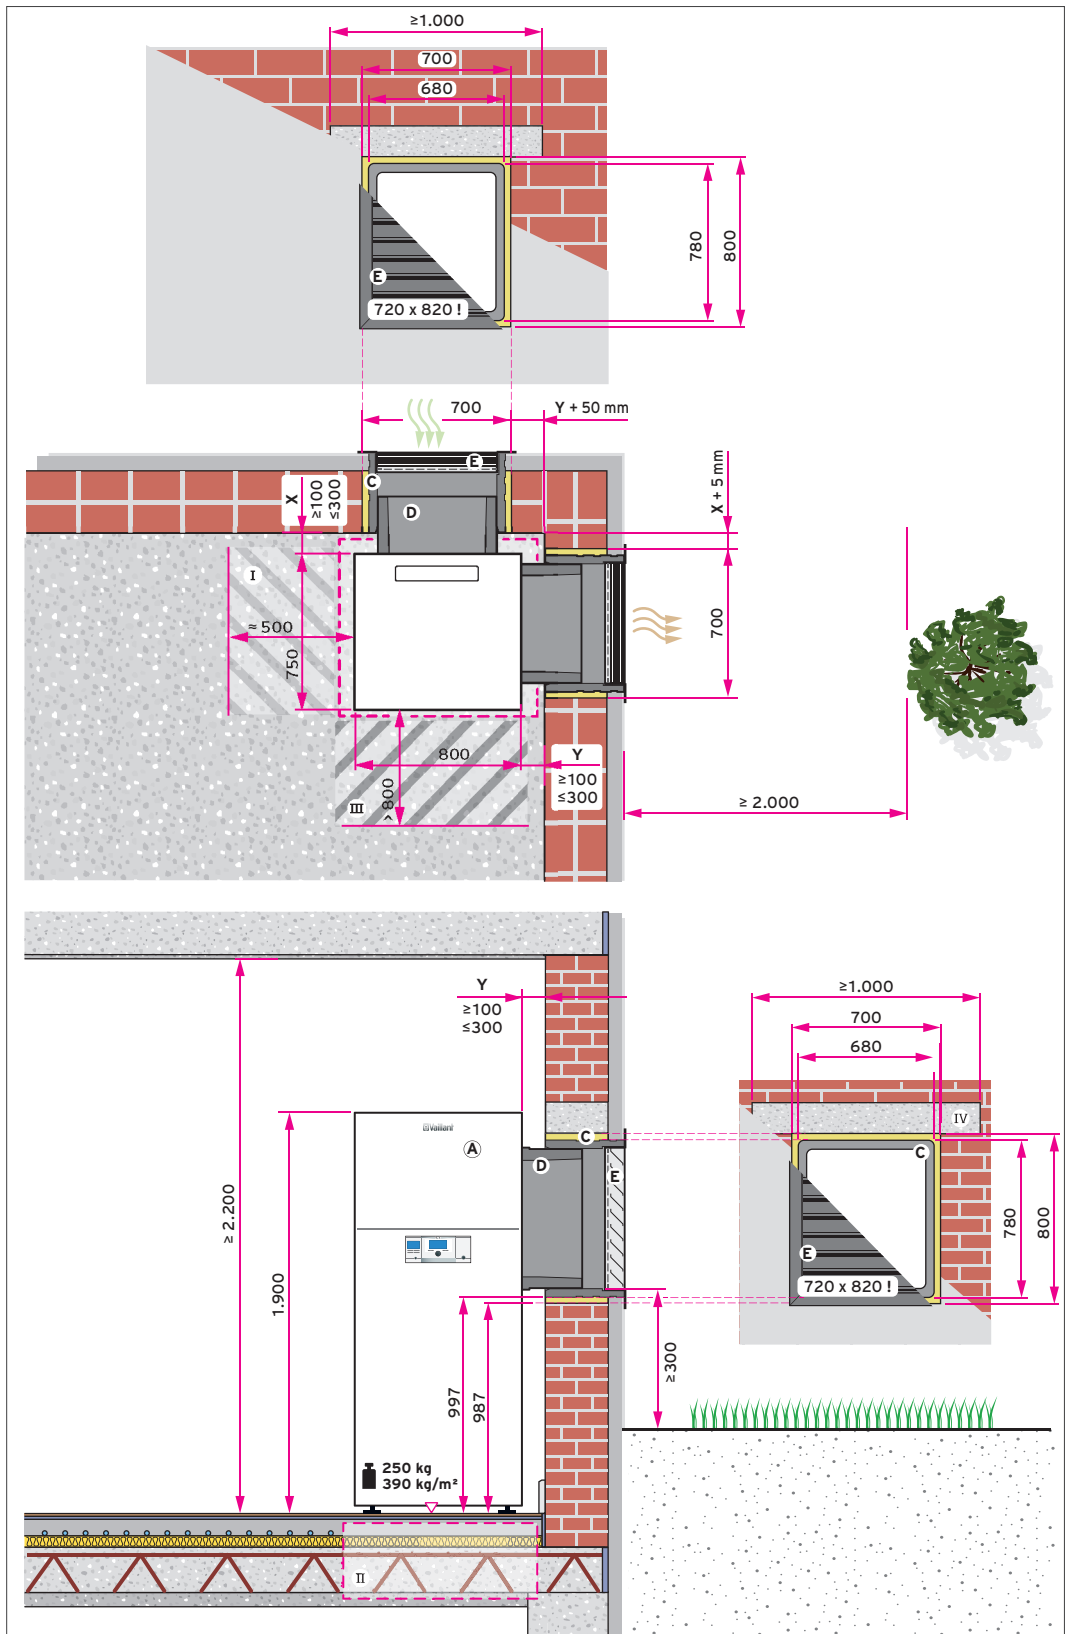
versoTHERM installation situation, ground floor - installation in the corner of a room
